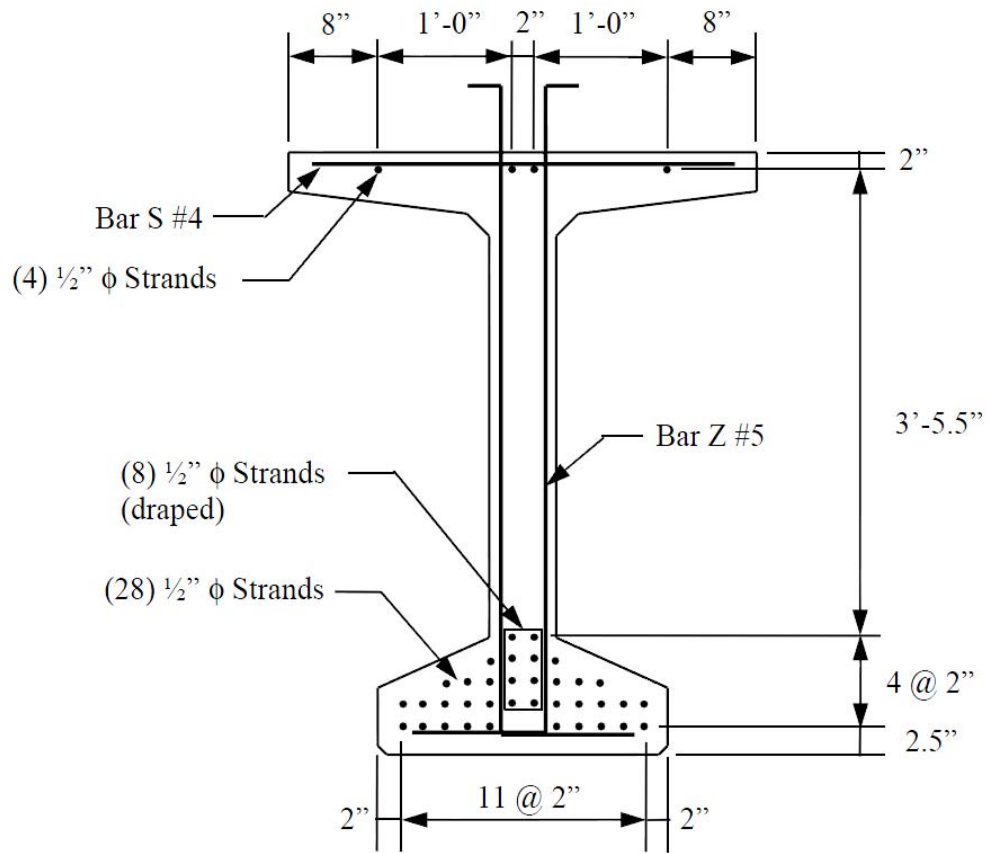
Mild steel and strand arrangement for a BT-54 girder at midspan.
